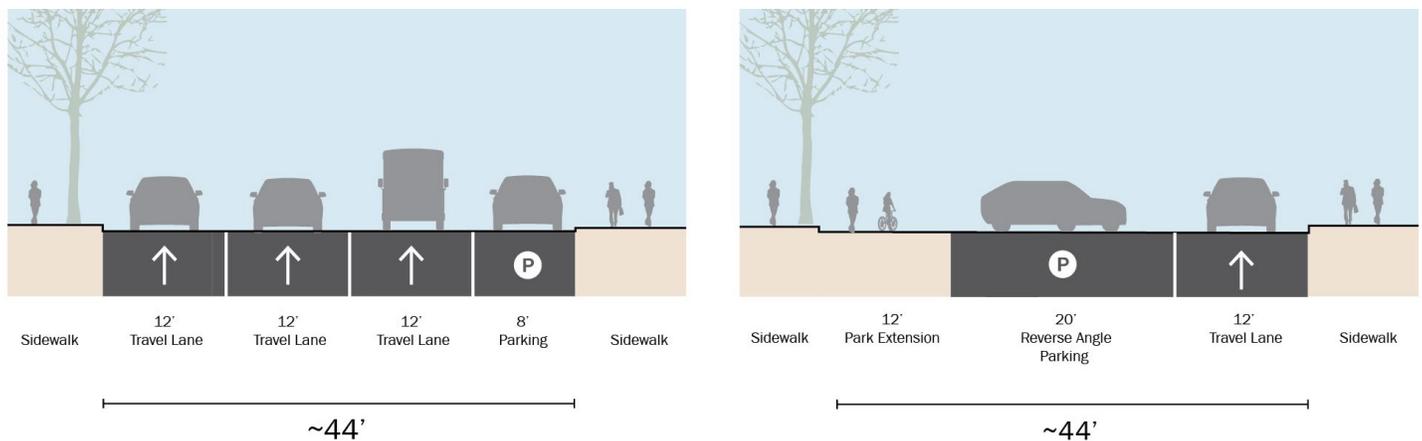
Existing and Recommended Cross Section of Lincoln Park (South Side of the Park looking east)
